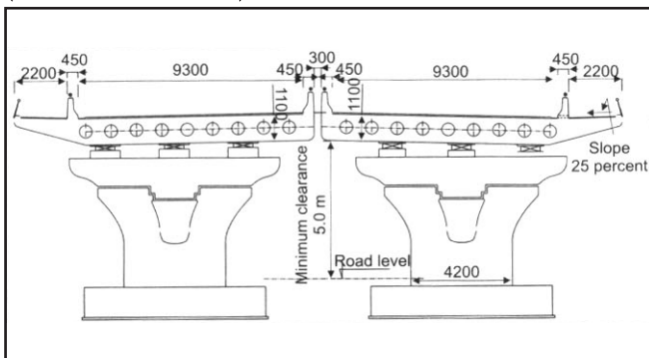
Dhaula Kuan interchange in Delhi: Straight bridge (cast-in-situ voided slab)
